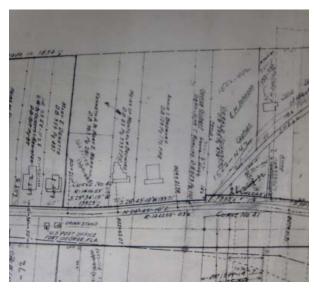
, Portion of 1949 plat of proposed road improvements. The Broward House with its extended porch is in the center. To the left is Montcalm Broward's house, which later burned down. (Robert M. Angas, Civil Engineer. In files of Jacksonville Department of Public Works.
